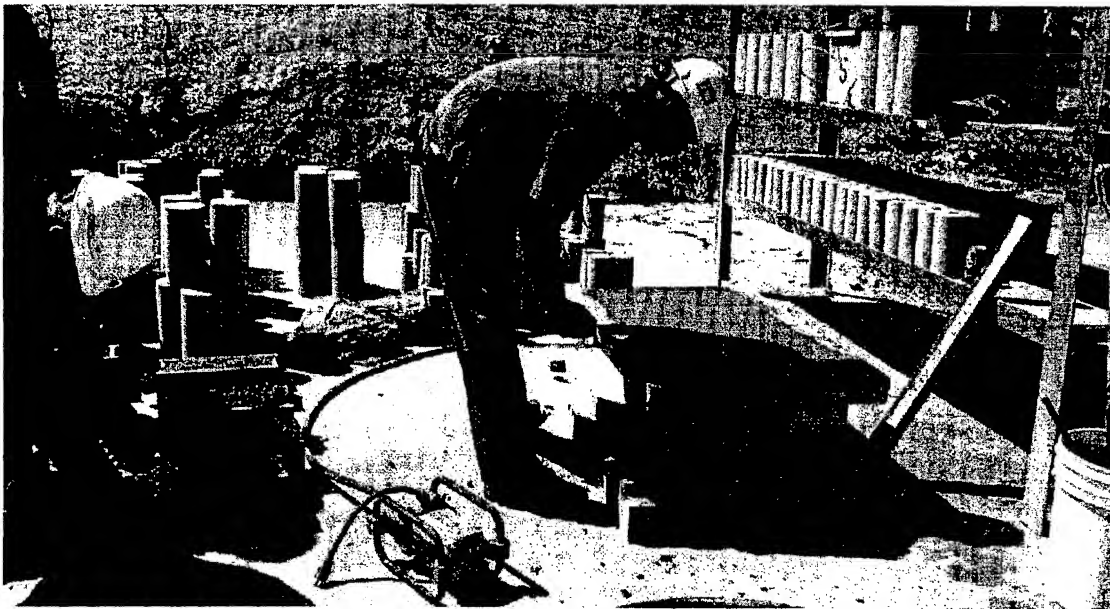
Construction of Block for Cored Cylinder Testing at Tindall Concrete Plant
